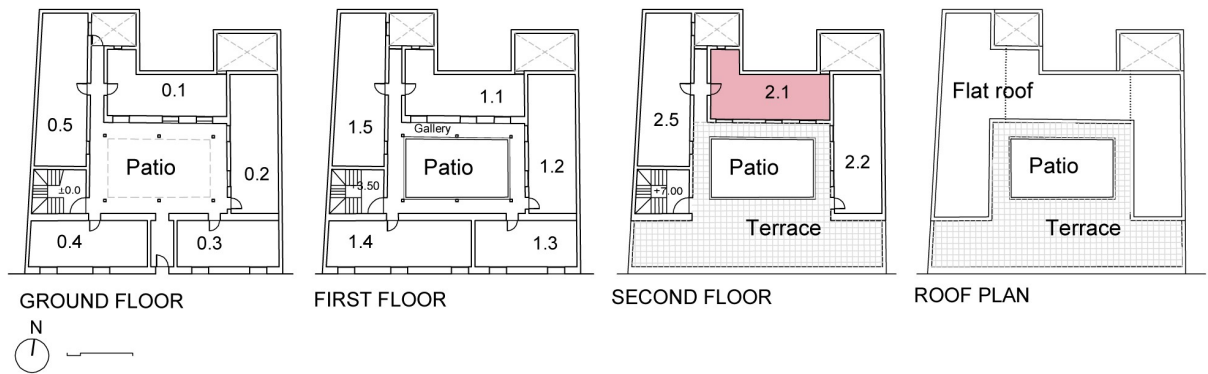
Case 3: floor plans of the ‘Corral de vecinos’ building marking the position of the apartment studied in colour.
